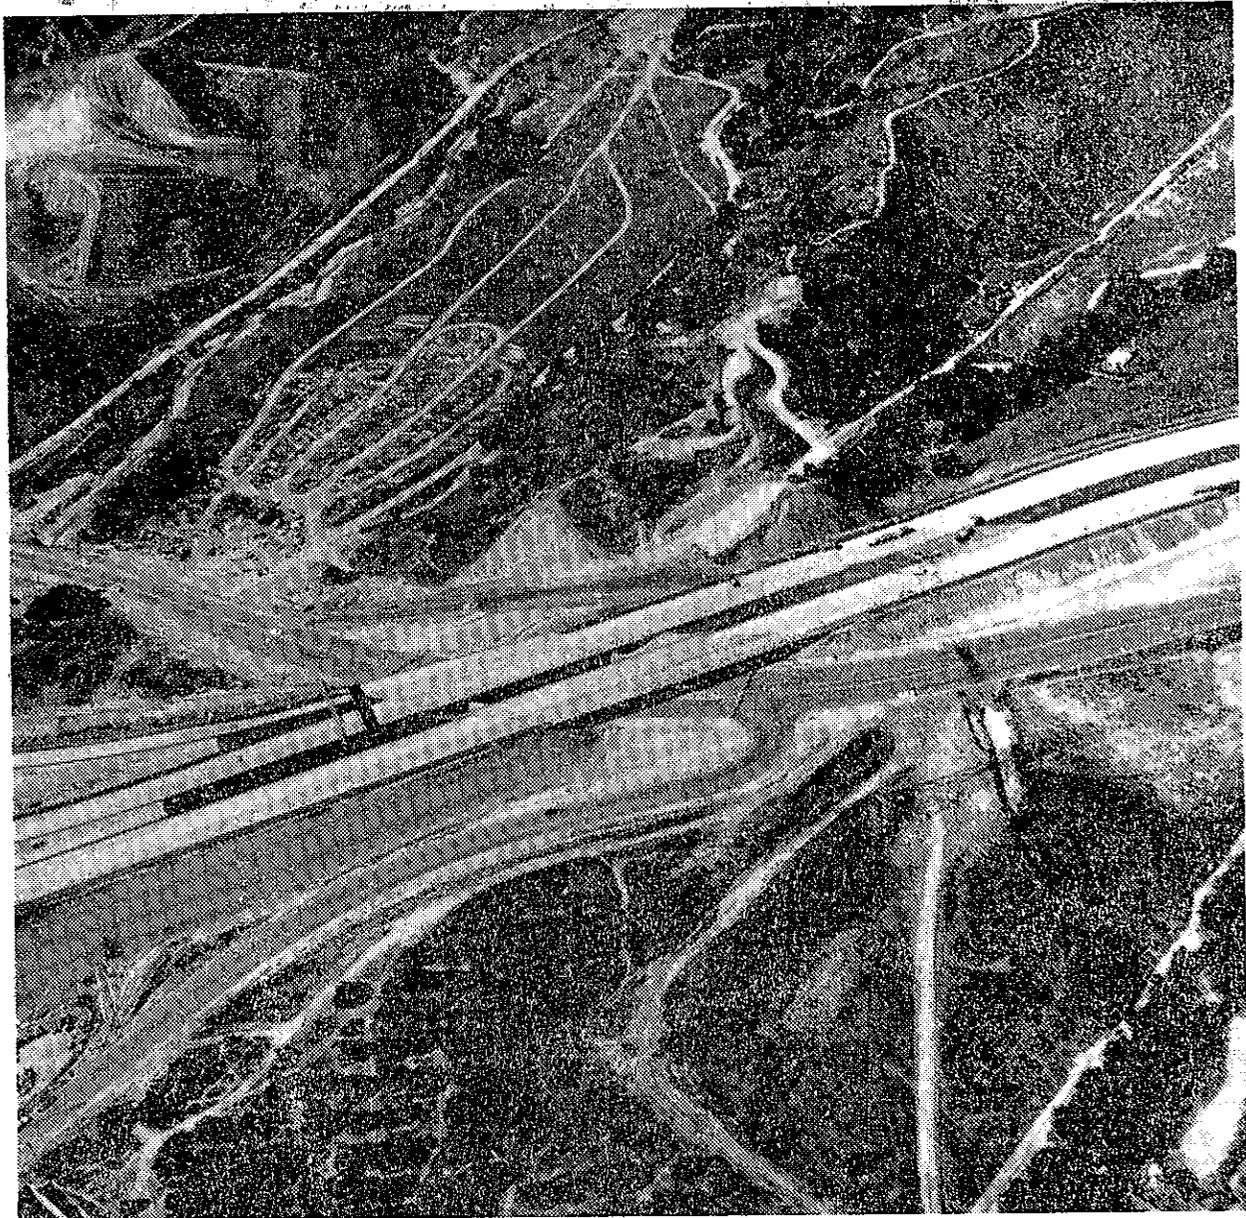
Looking northerly at the Foothill Boulevard Undercrossing.
